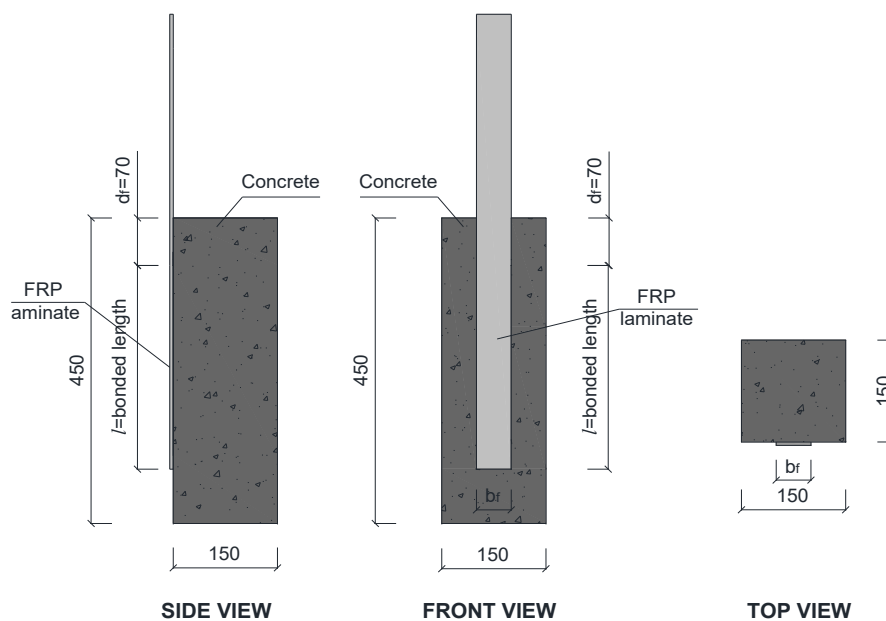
Specimen Dimensions and Details of Bonded FRP system (FRP-to-concrete specimens). Dimensions in mm.
